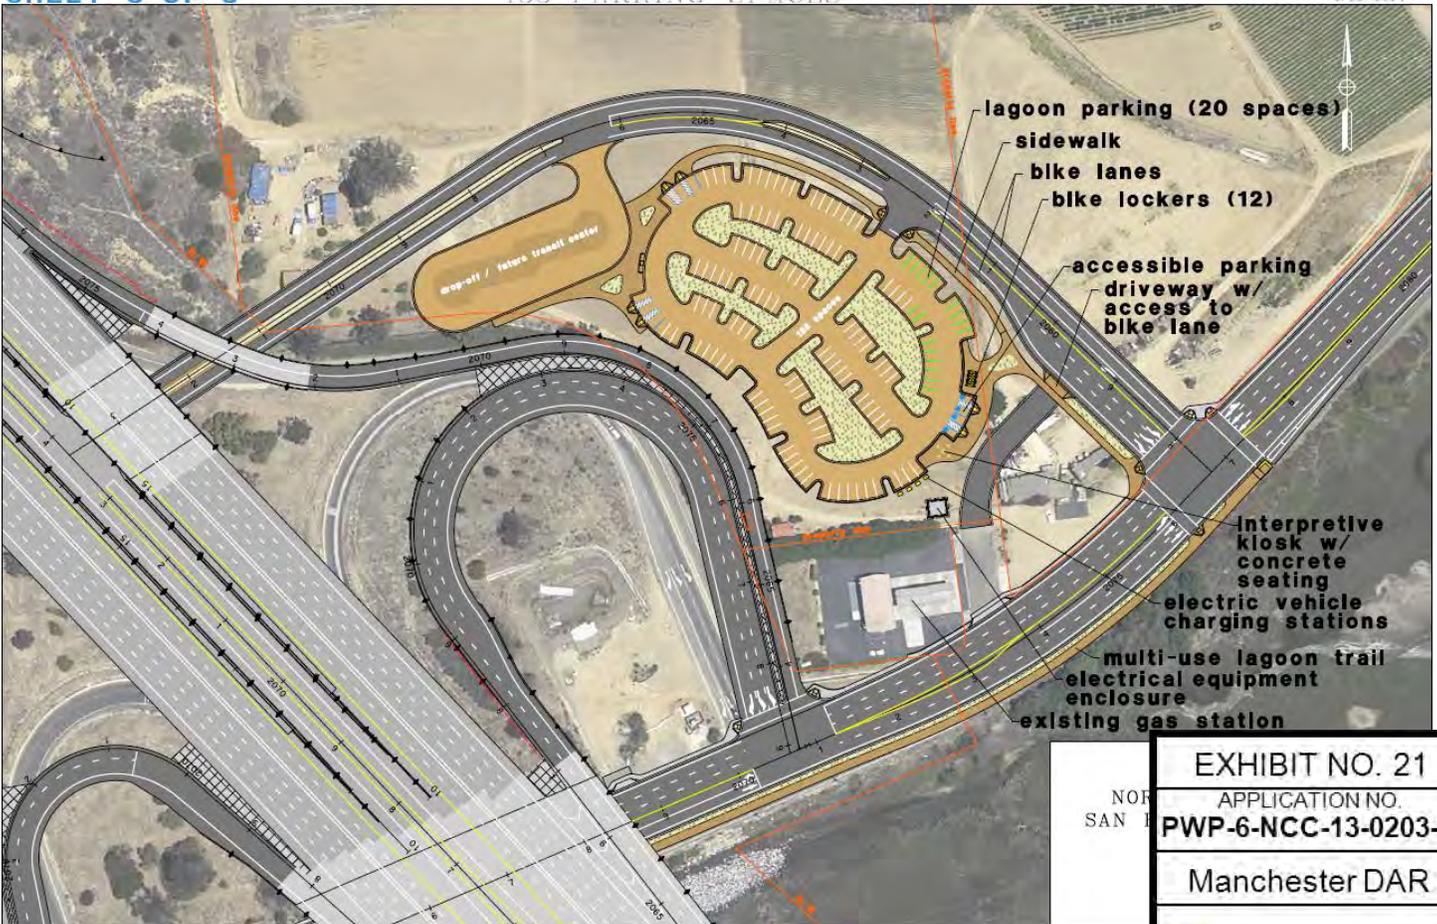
MANCHESTER DIRECT ACCESS RAMP
